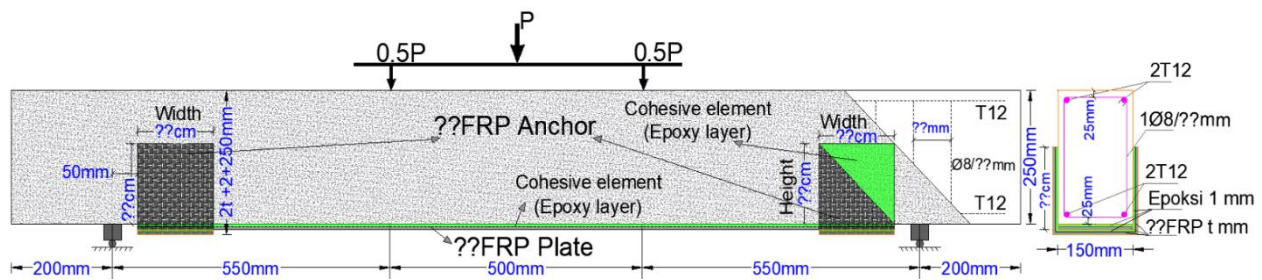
The geometry, reinforcing placement, and boundary condition of tested beams
